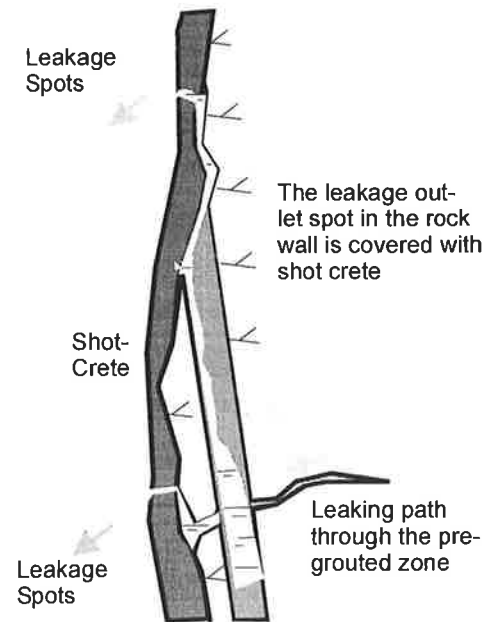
Grout holes with leaking hole fillings convey water from the area outside the grouted zone via thin fissures not penetrated with the cement grout. The leakage is difficult to observe on the floor covered with mud and water from drilling for grouting and bolting operations
